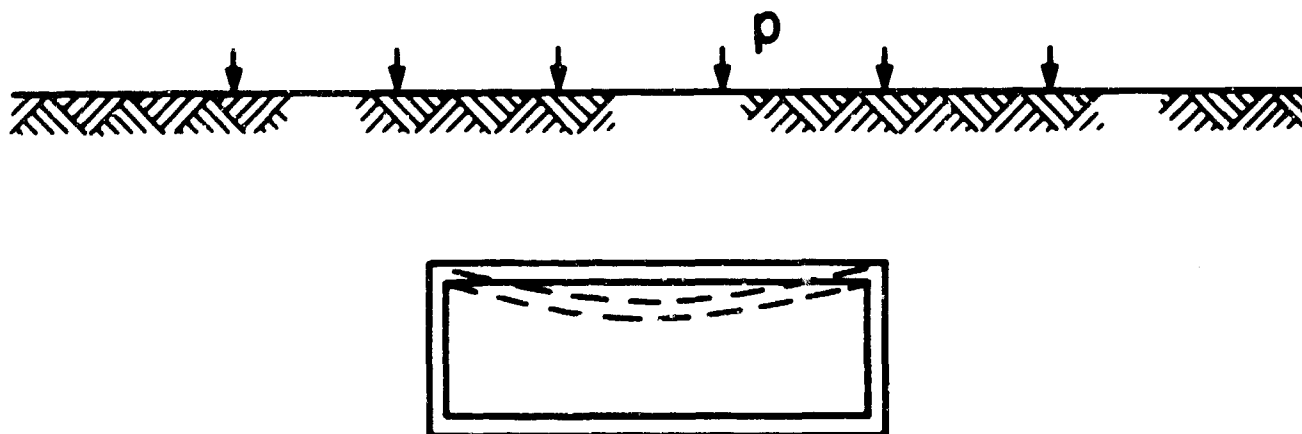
Schematic of Roof Deflection of Loaded Underground Structure
